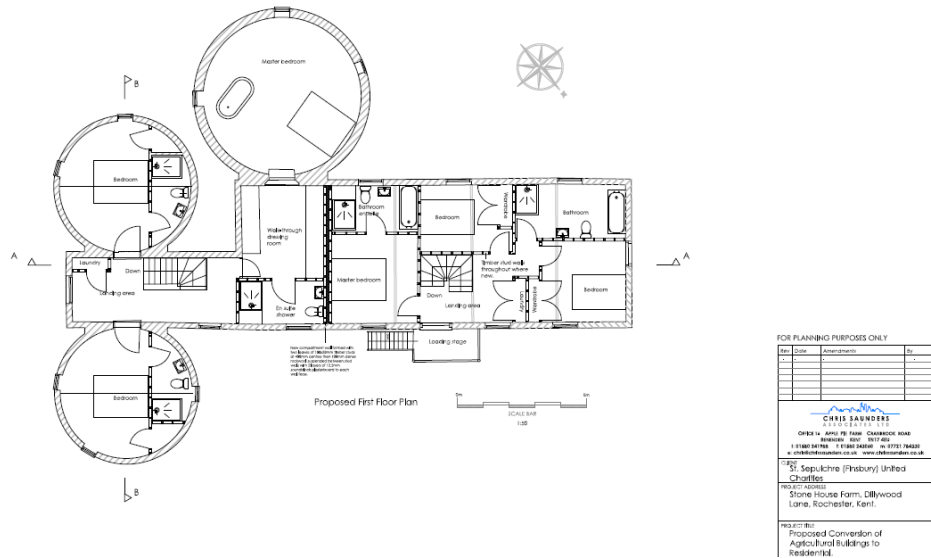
Proposed first floor plan ©Chris Saunders Associates Ltd. drawing number: 1788/12.
